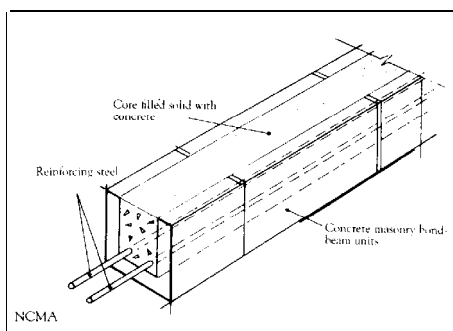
Bond beams are made from special masonry units filled with concrete or grout and reinforced with steel. They give increased strength and stiffness to the wall, thereby reducing cracks.
